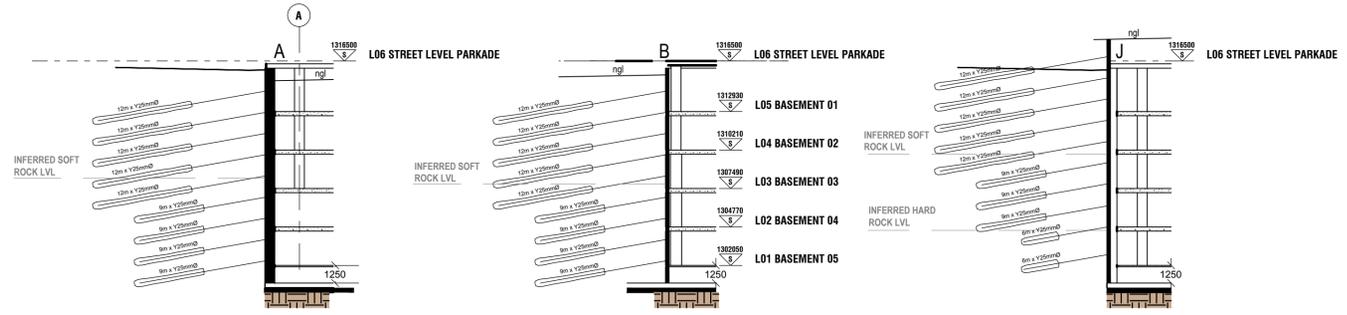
DETAIL OF SUBSOIL AT BASEMENT LEVEL
